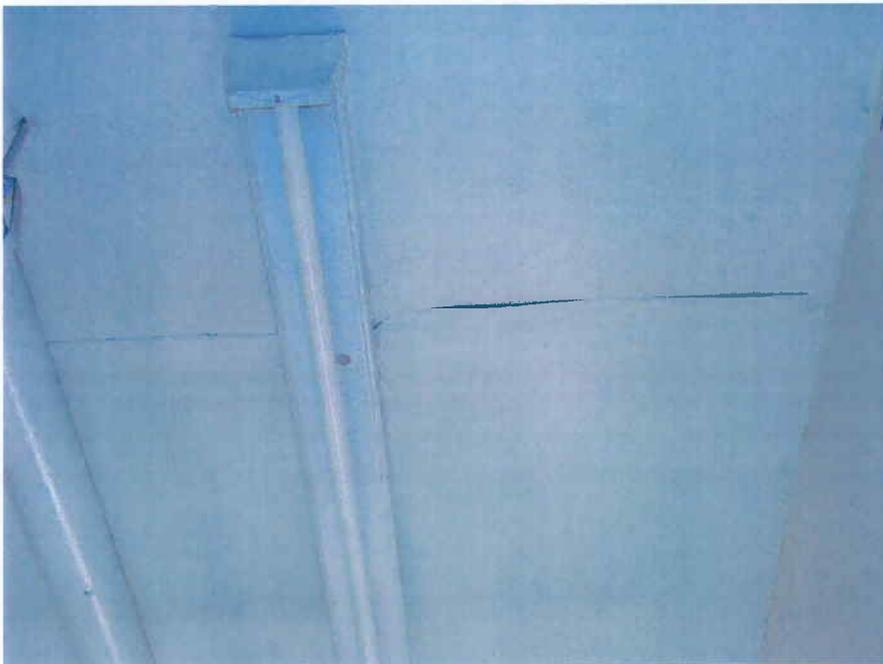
Cracks at gypsum board ceiling - Hangars 2 & 3.
